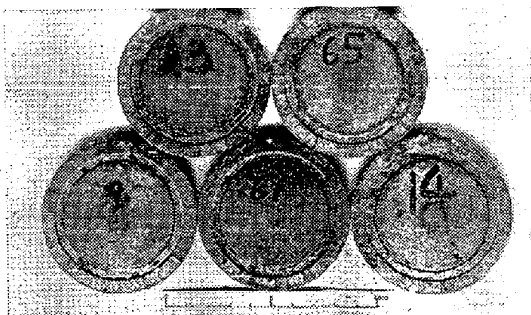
Appearance of specimens after 100 cycles (Specimen B series)
